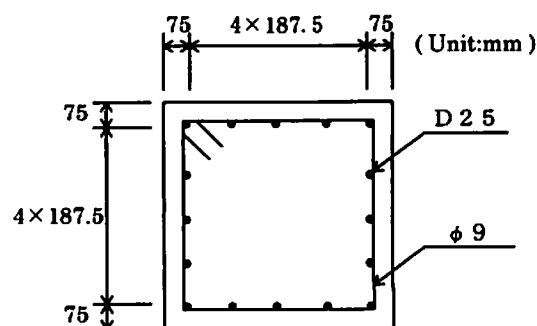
RC viaduct column cross-section (900 × 900 mm).
